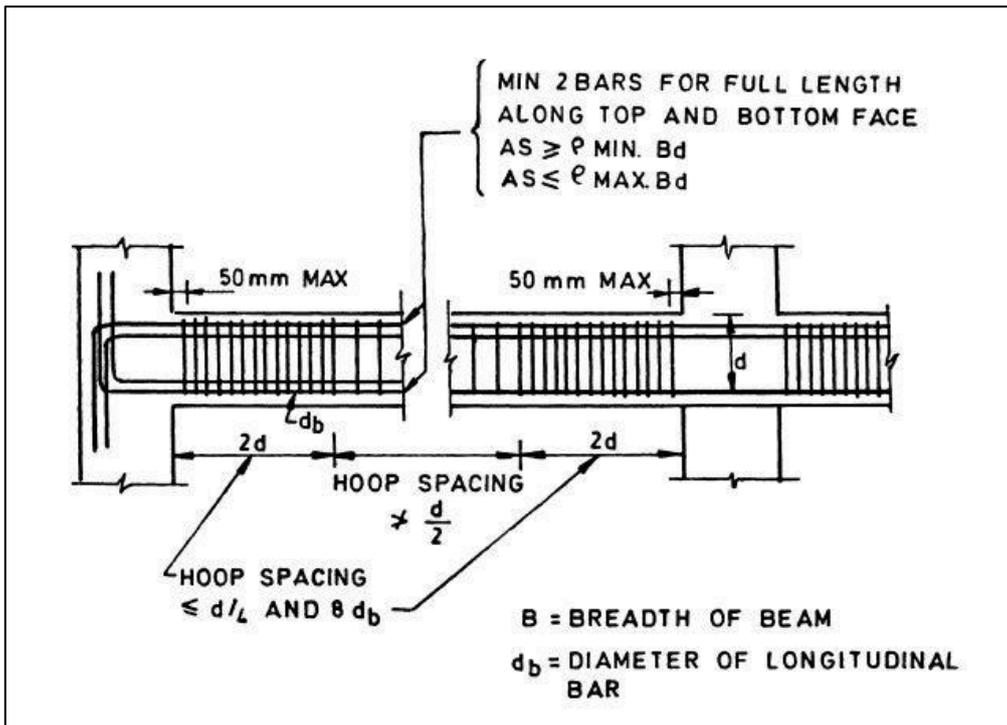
Beam Reinforcement as per IS 13920(2002)
